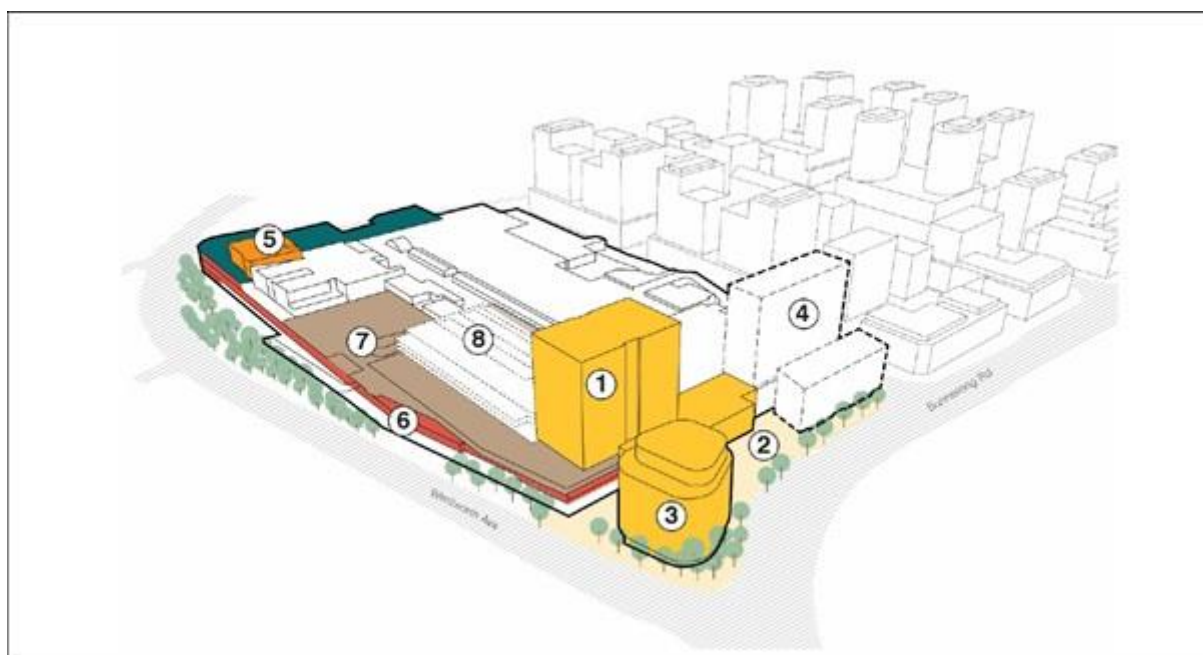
Proposed building envelope and footprint (Source: Woods Baggett Urban Context Report)
